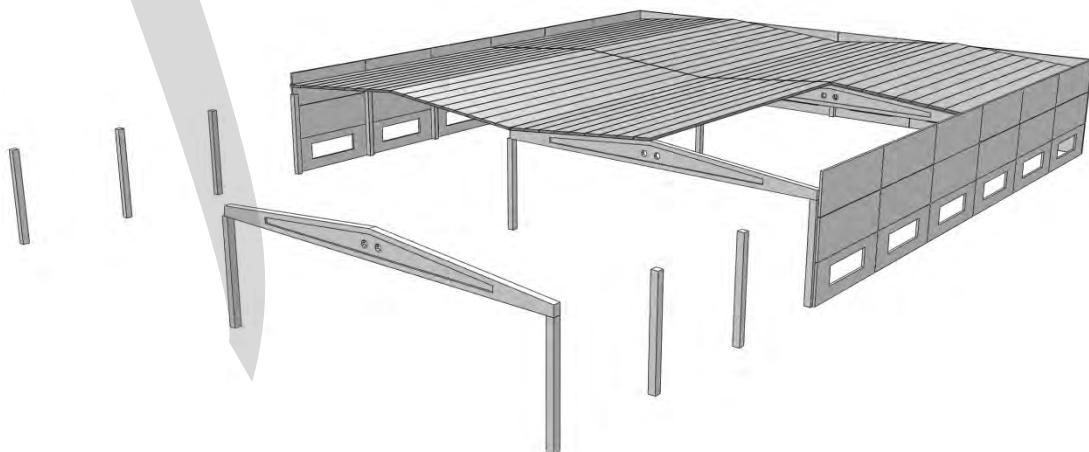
Scheme of an industrial building with portal frames and ribbed concrete roof units
